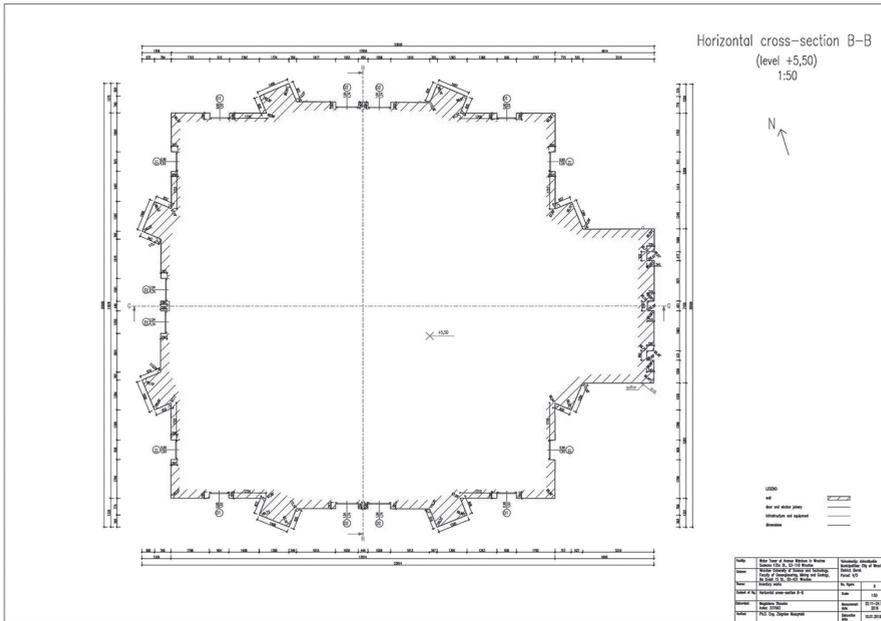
Horizontal cross-section B-B (at the level of 5.50 m above ground) [9]
